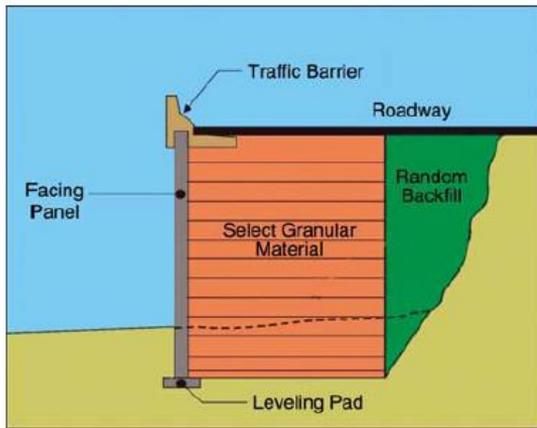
MSE wall. (Courtesy of The Reinforced Earth Company.)
